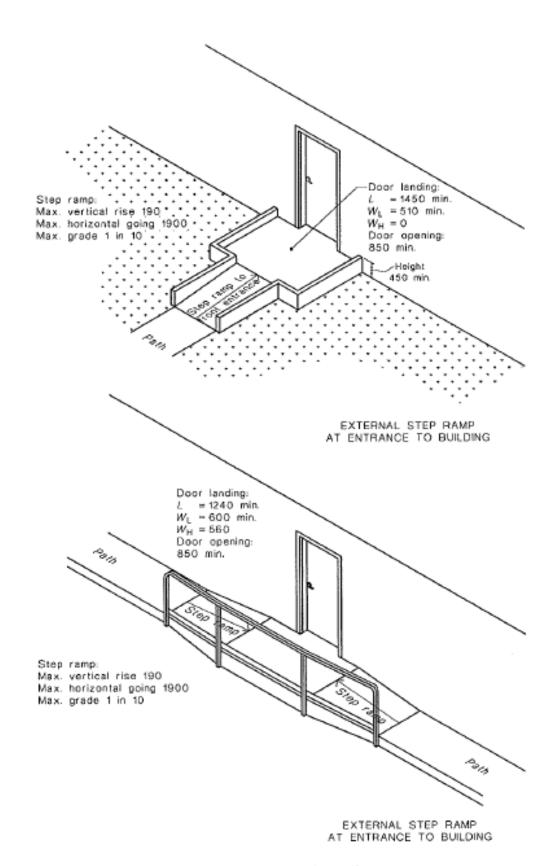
(B) EXTERNAL STEP RAMPS AT ENTRANCE TO BUILDING
